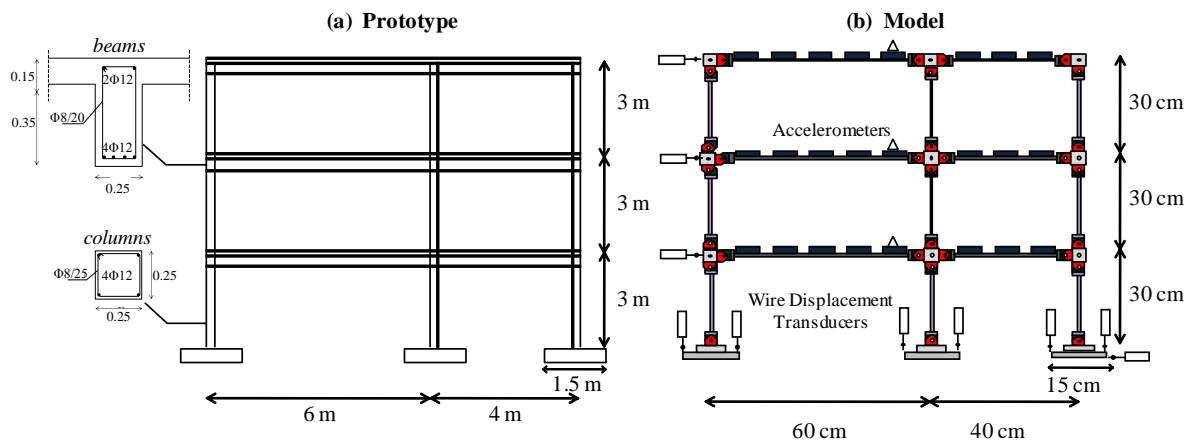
The under-study 3-storey building, inspired by the SPEAR building: (a) prototype, and (b) model.
